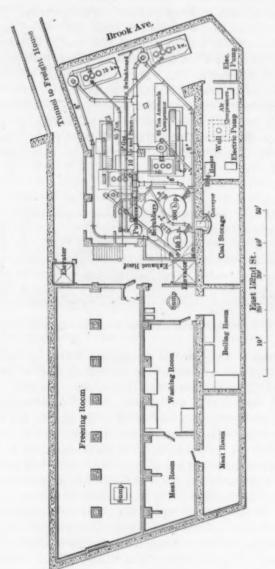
Plan Showing Location of Machinery, Apparatus and Connections
